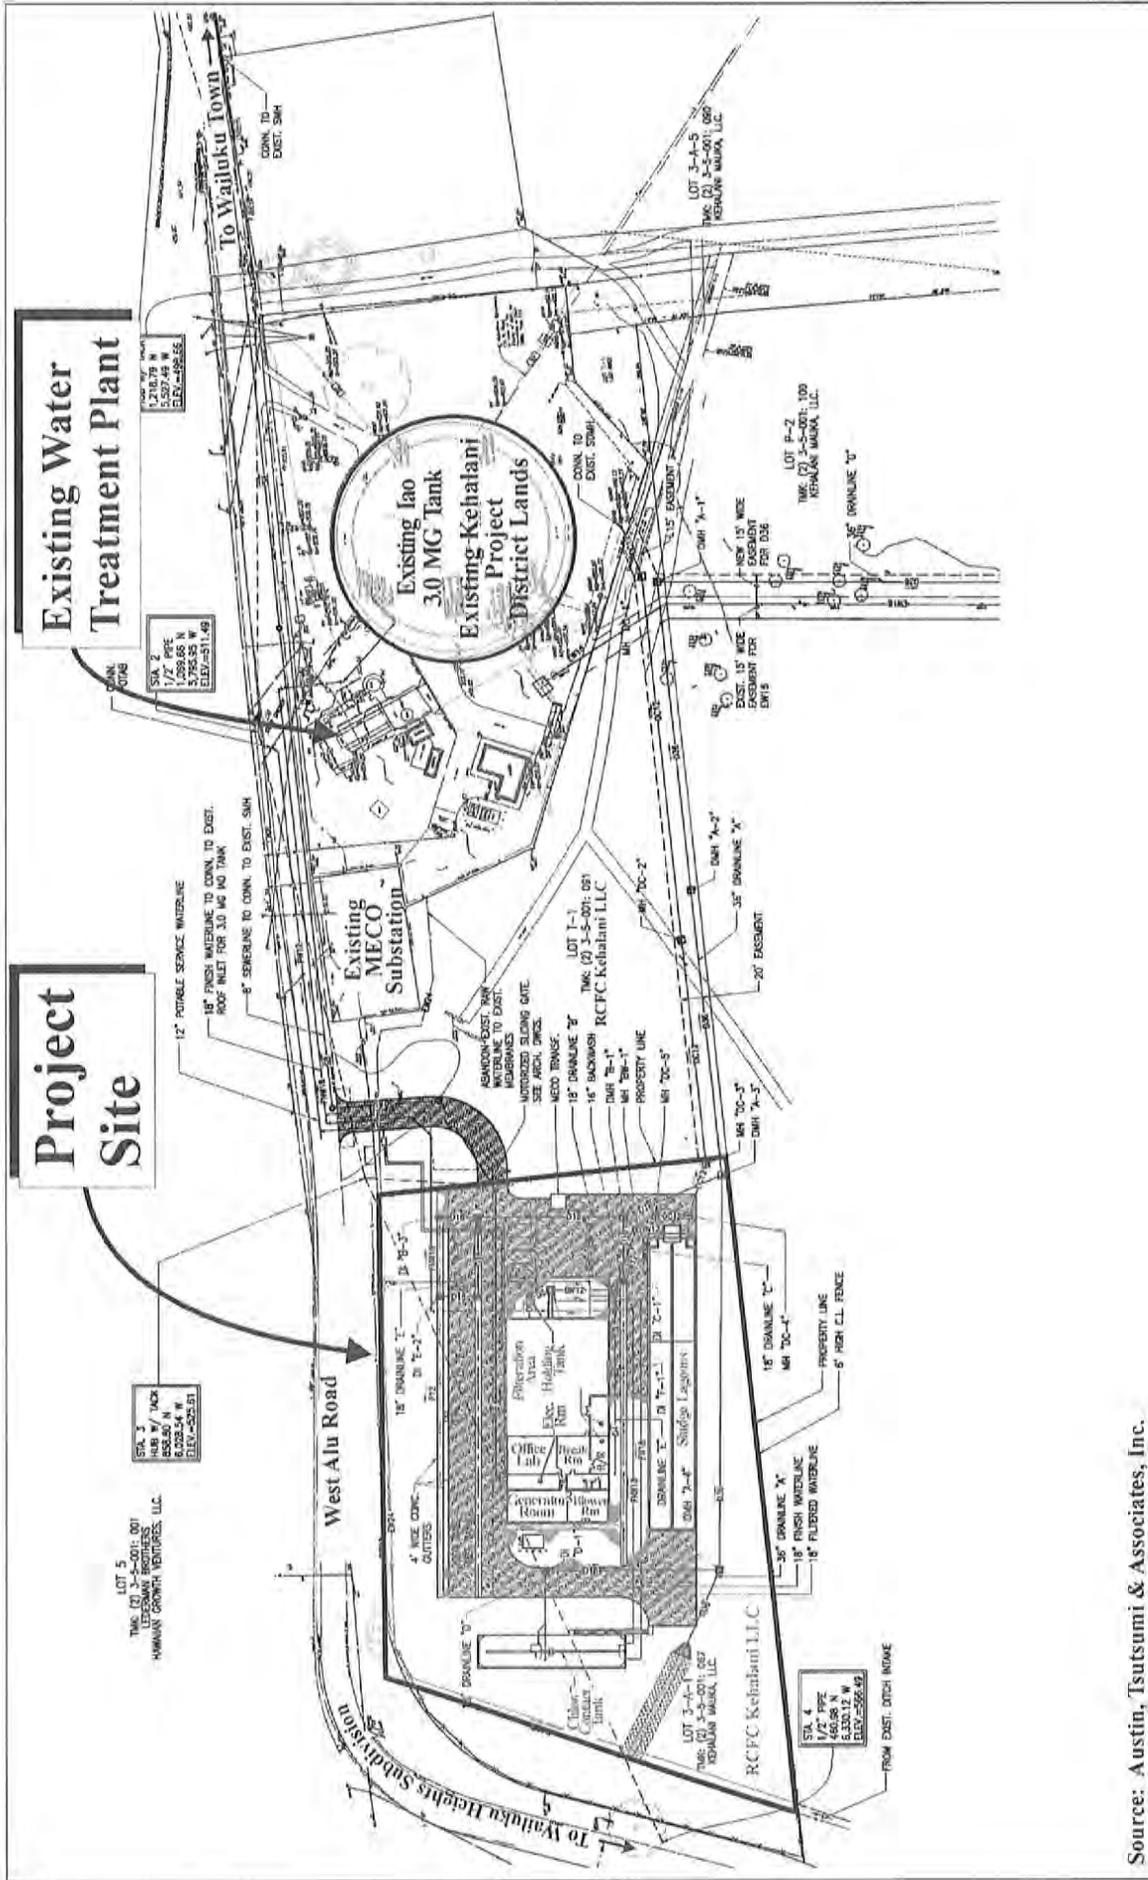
Proposed Iao Water Treatment Plant Upgrades Site Plan
